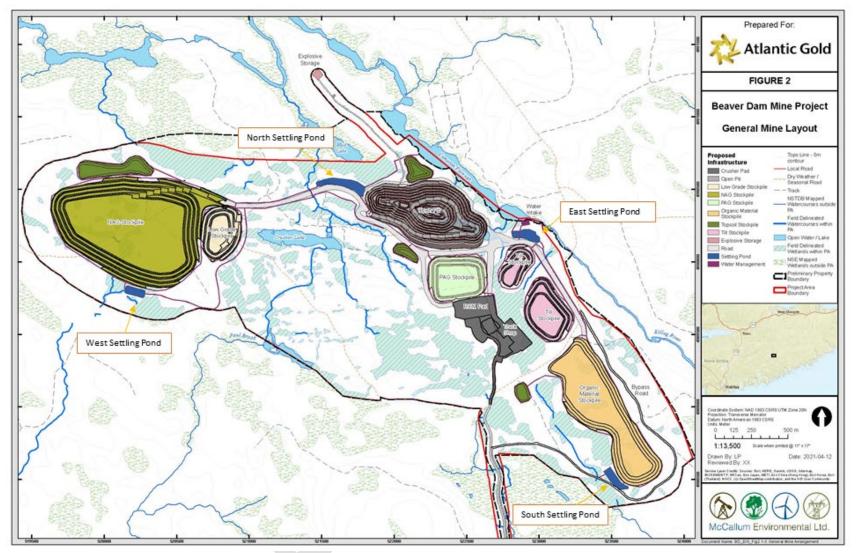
General layout configuration of settling ponds, Beaver Dam Mine Site
